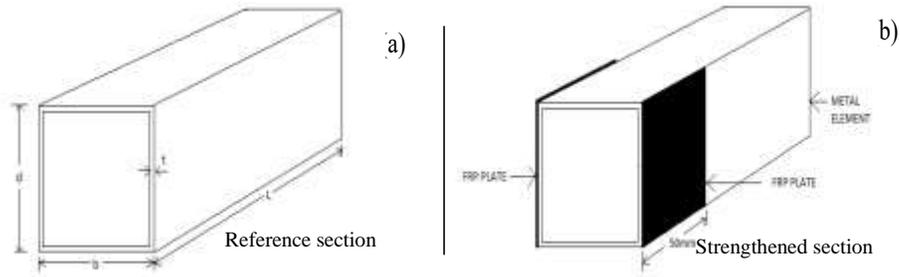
Dimension of tubular metal section and FRP strengthen specimen for ETF loading
